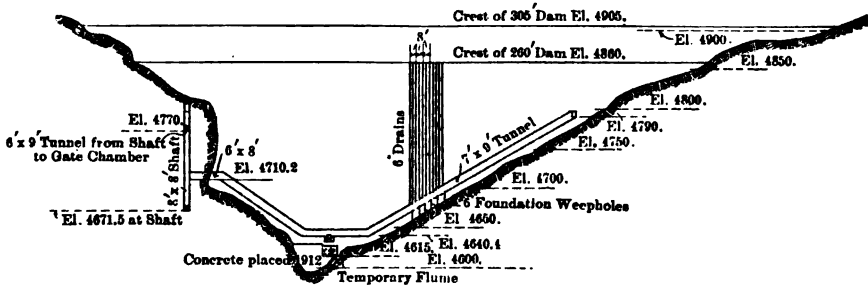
SPAULDING DAM, PROFILE ACROSS CANYON.
